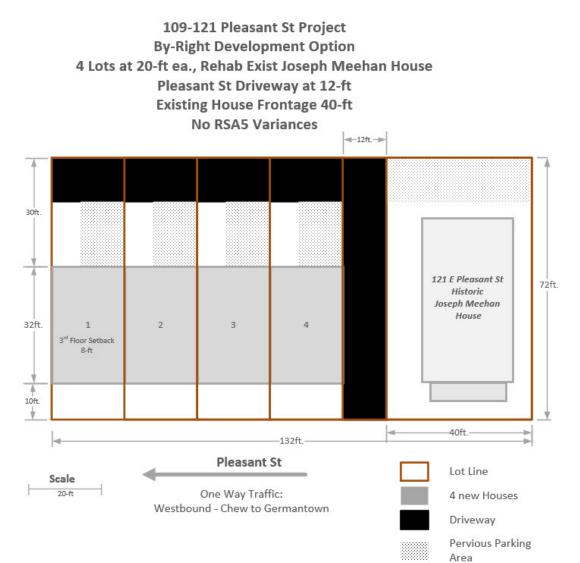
shows a by-right option for the 109-121 E Pleasant St site that includes 4 new single-family attached houses that meet the minimum lot area and front setback requirements, a 3rd floor 8ft setback, and provides the required side yard for the existing Joseph Meehan House. The 4-new houses would have 1,985 sf of gross building area, slightly larger than the Applicant's 1,716 sf target gross area. The Applicant could further reduce the building footprint to meet their 1,716 sf target if they choose to.
